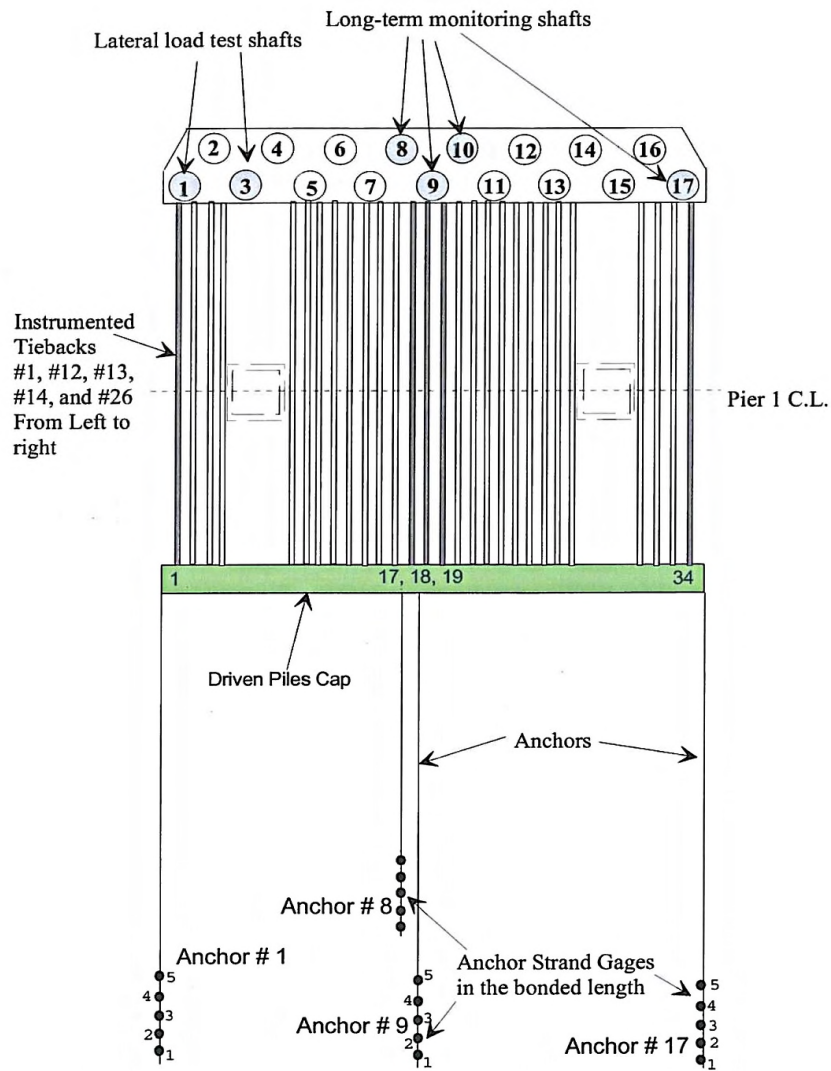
Plan of the stabilization system showing the locations of the instrumented foundation elements.
